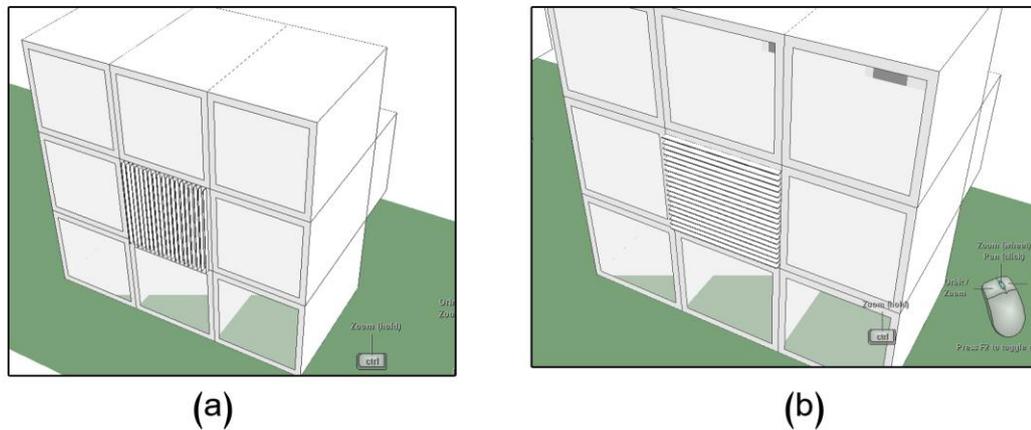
Office unit, virtual model on IES. (a) Vertical external louvers installation for the East and West façade, (b) horizontal external louvers installation for the south façade.
